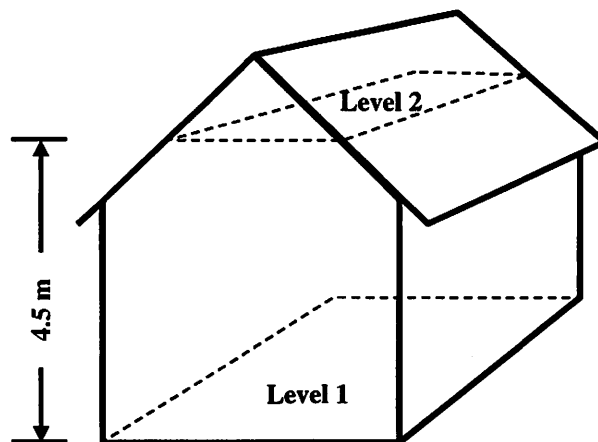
A building containing a vaulted ceiling with multiple wall plates.
